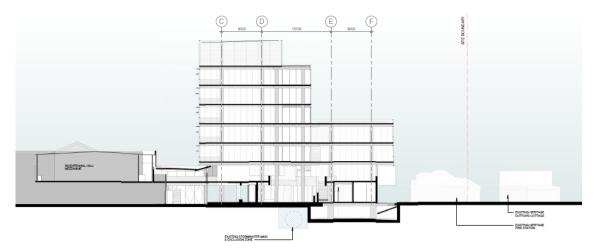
Section 1 demonstrating the location of existing Council trunk drainage pipe with foyer counter-levered above.
